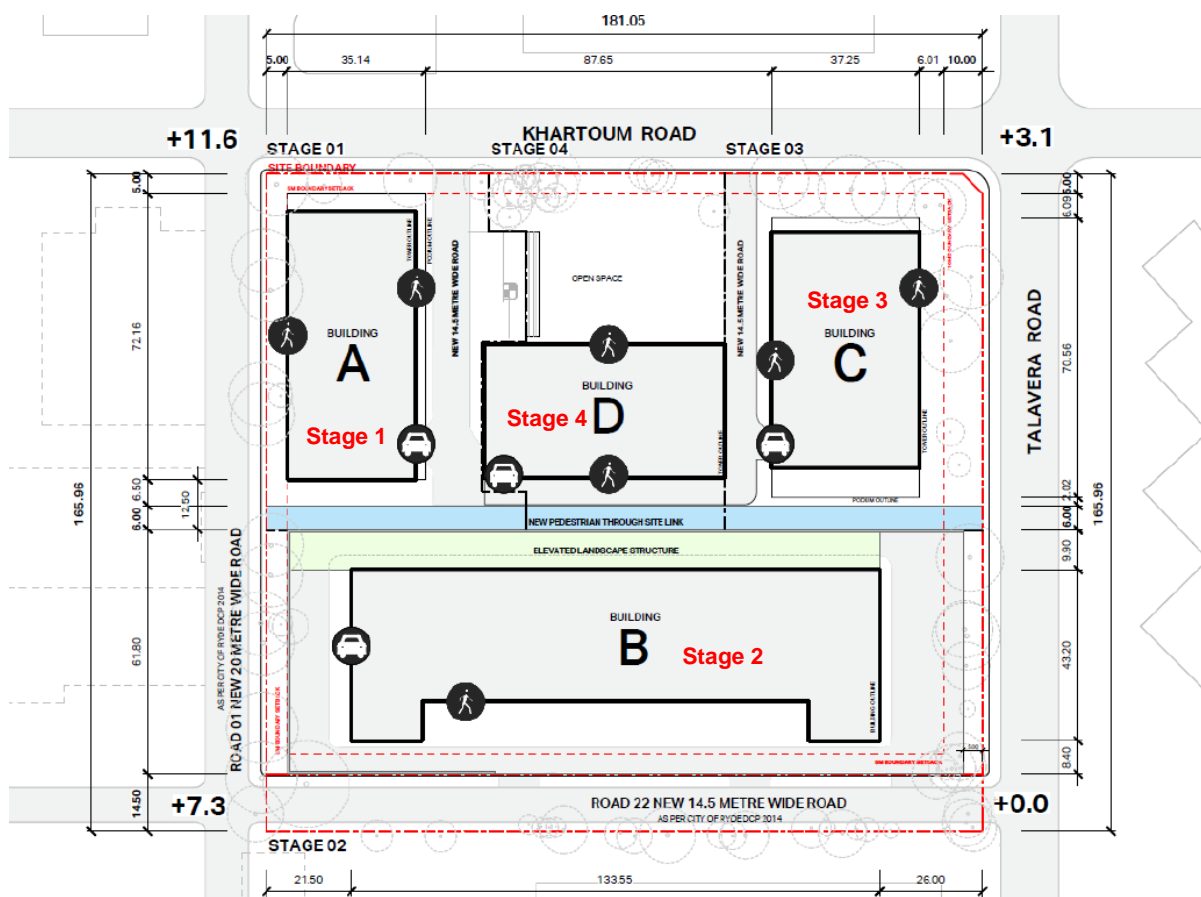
Approved staging plan (approved under LDA2020/0229). The current DAs are in respect of Building C and Building D.
